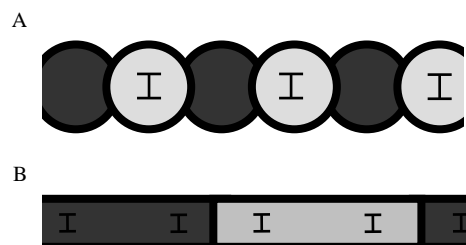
Schematic plan view of the secant execution of (A) cylindrical soil mix columns and (B) rectangular soil mix panels.
